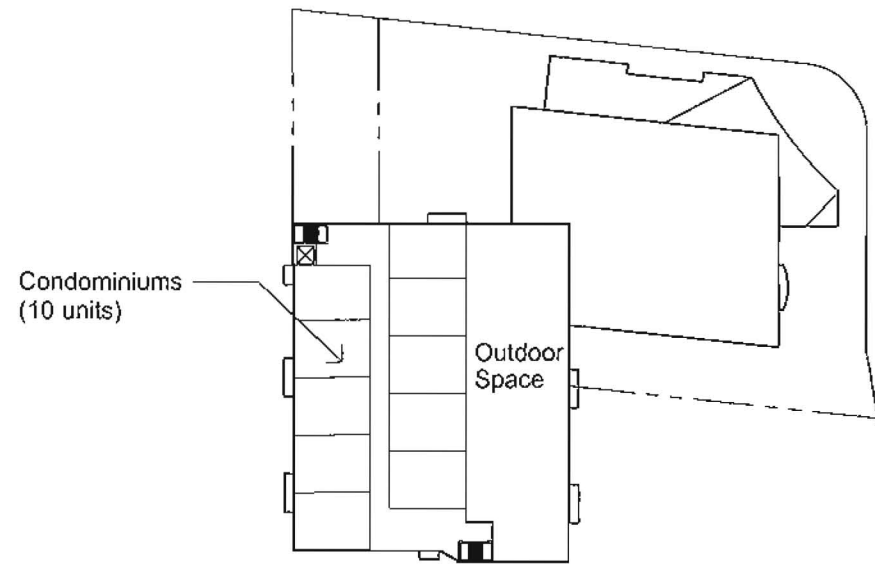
Development Concept Plan = 1st/ Boyle = Site No. 1
